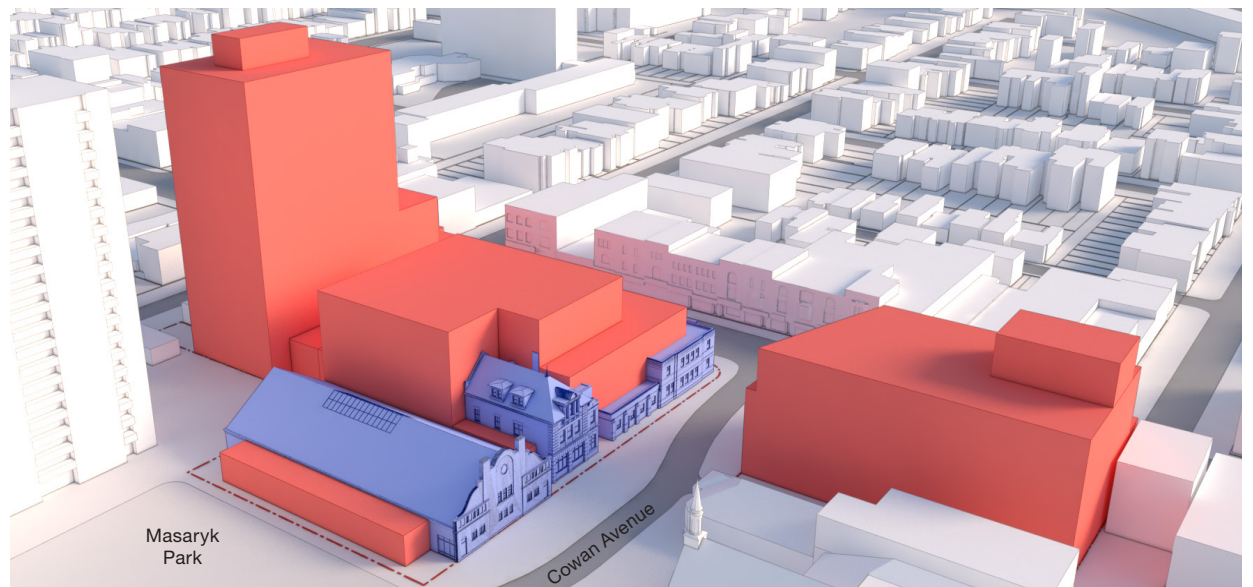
/ Massing model of Parkdale Hub looking north towards Queen Street West.
